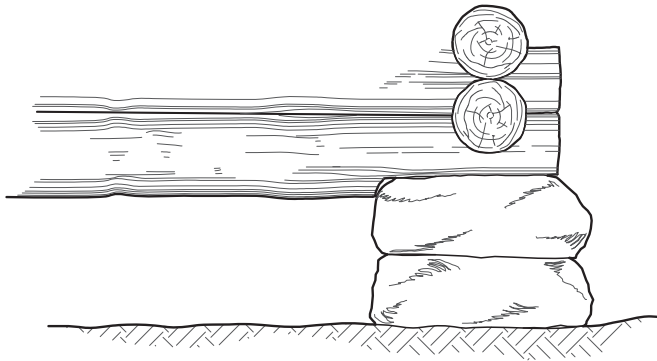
This drawing shows a stone pier constructed of flat rocks supported directly on the ground surface, which is typical of historic log cabins. The sill log is hewn to fit the top of the pier.
